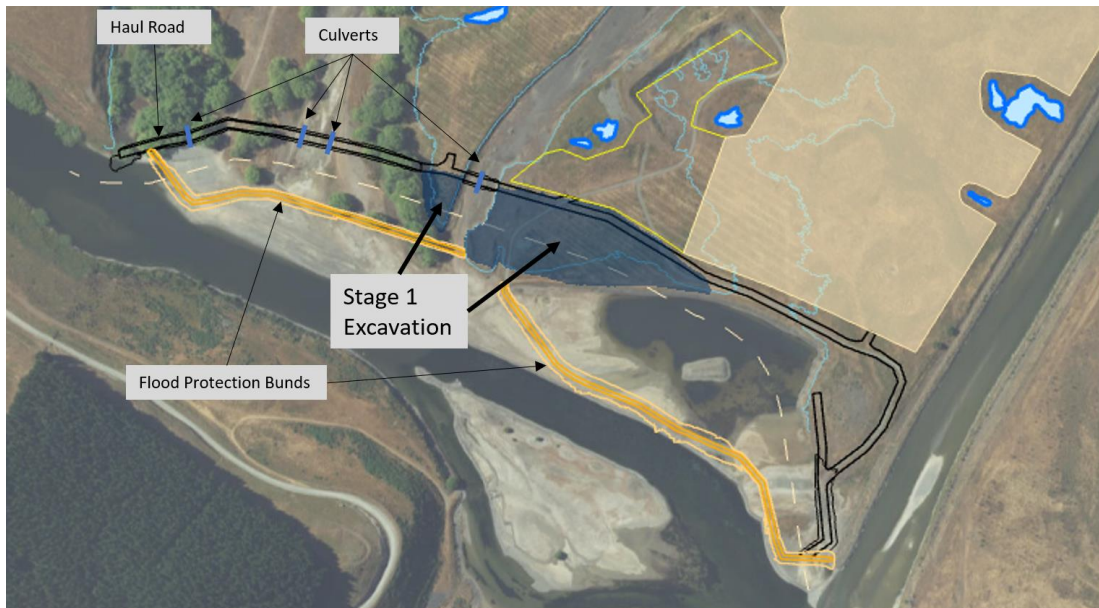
Location of Stage 1 Excavation, Haul Road and Flood Protection Bund construction.
